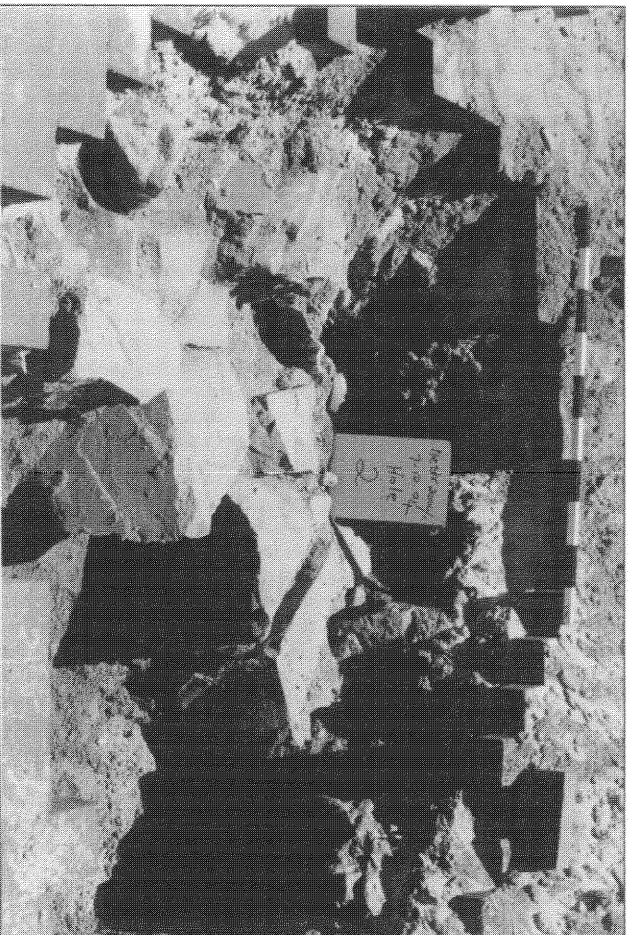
Hole 2 with the foundations of a previous structure; 2004.
